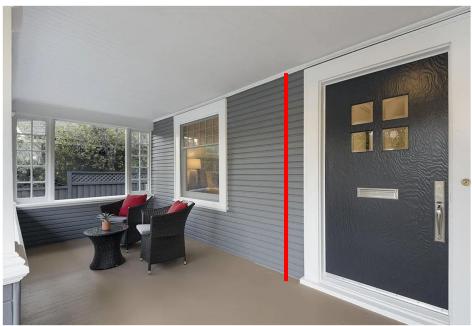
Proposed bathroom would enclose this section of the patio, starting approximately 6"-12" from existing entry door trim (see red line above). No modifications to be made to entry door/trim.
